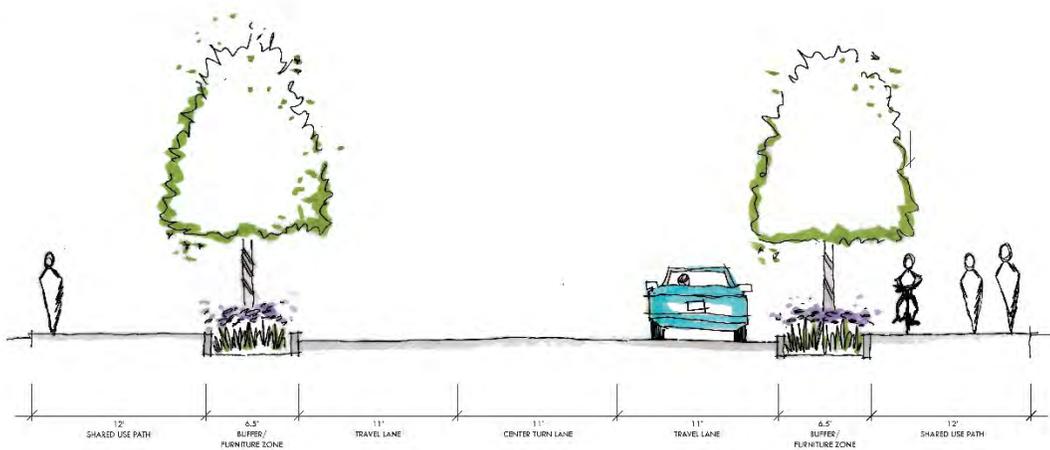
| Mixed District Recommended Typical Cross Section
